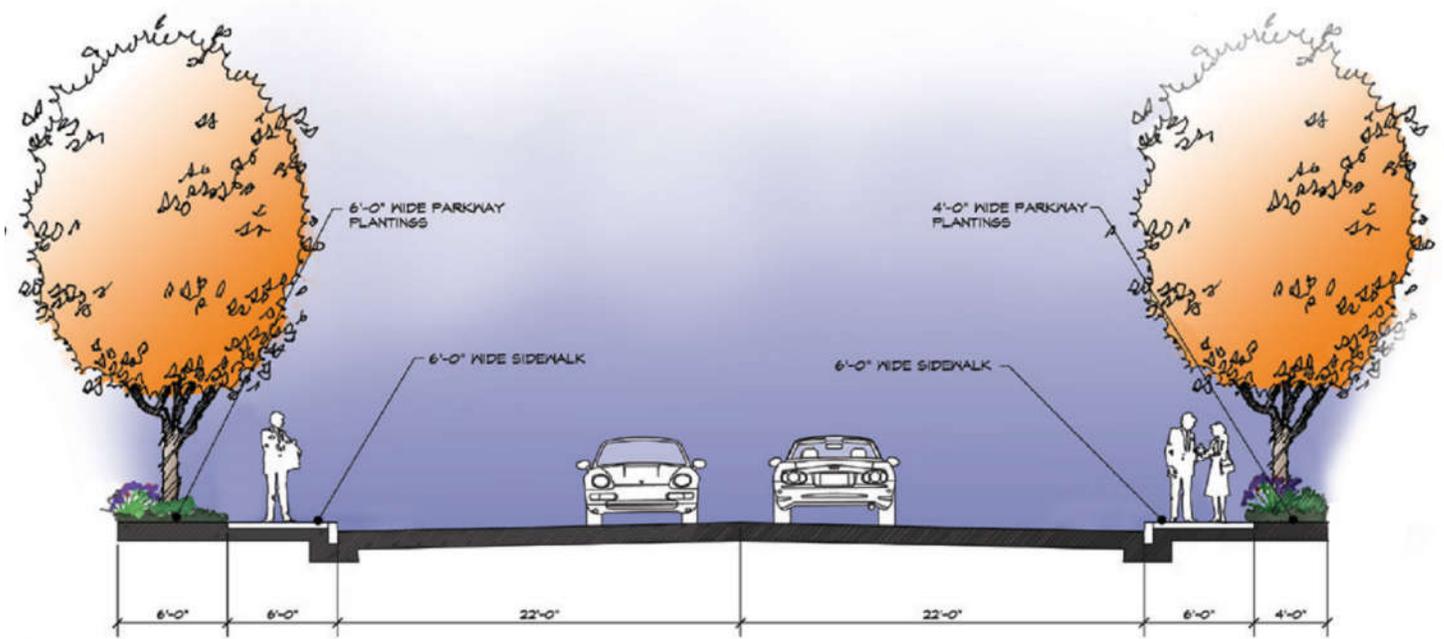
CONCEPTUAL JEFFERSON AVENUE LANDSCAPE SECTION
